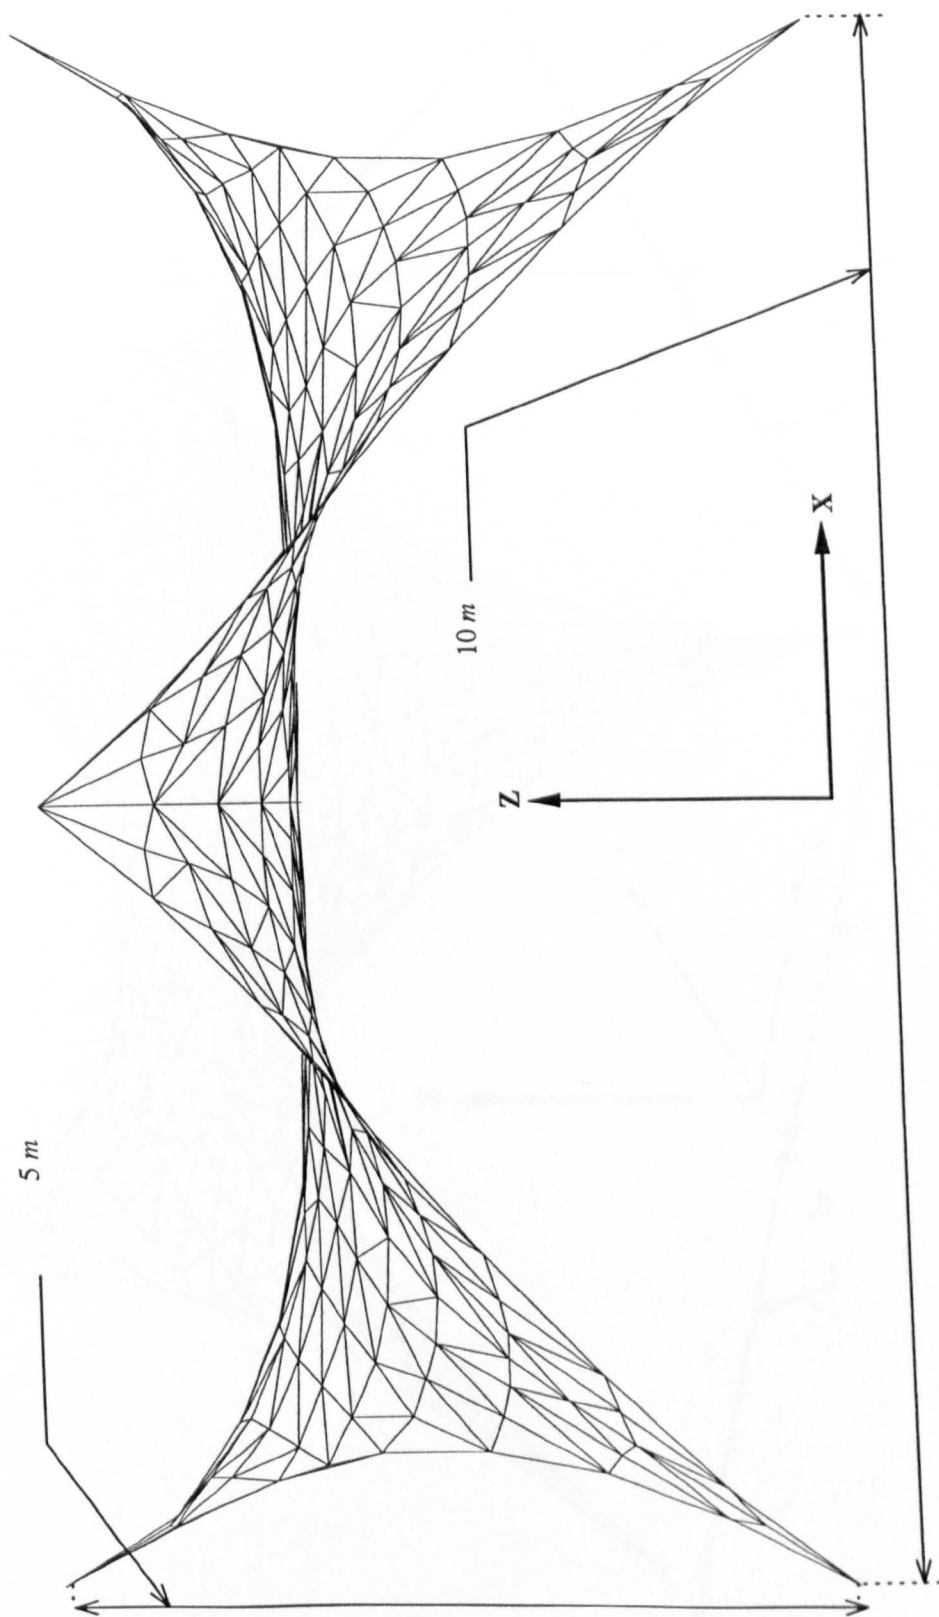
Example 5.2.7.2 - Side Elevation (Cross-Section BB').
